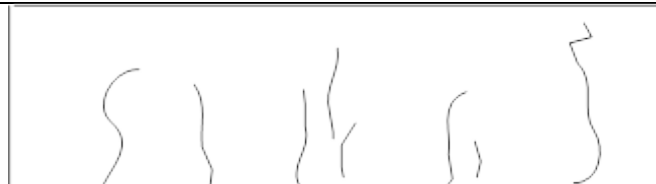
Tensile fatigue crack growth of polypropylene fiber reinforced concrete
